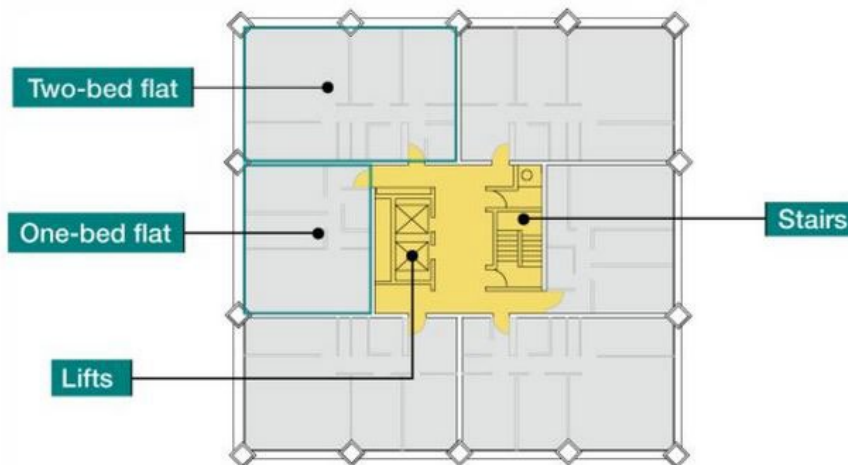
Typical floor plan of the Grenfell Tower [3].
